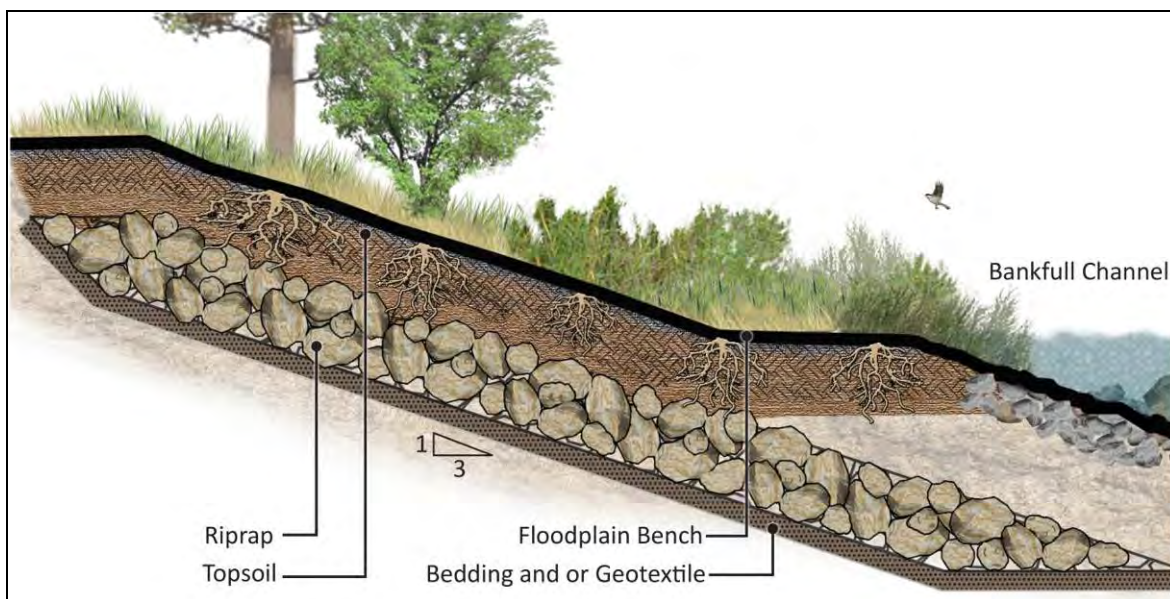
Bank Stabilization treatment, Riprap, 3H:1V slope.
